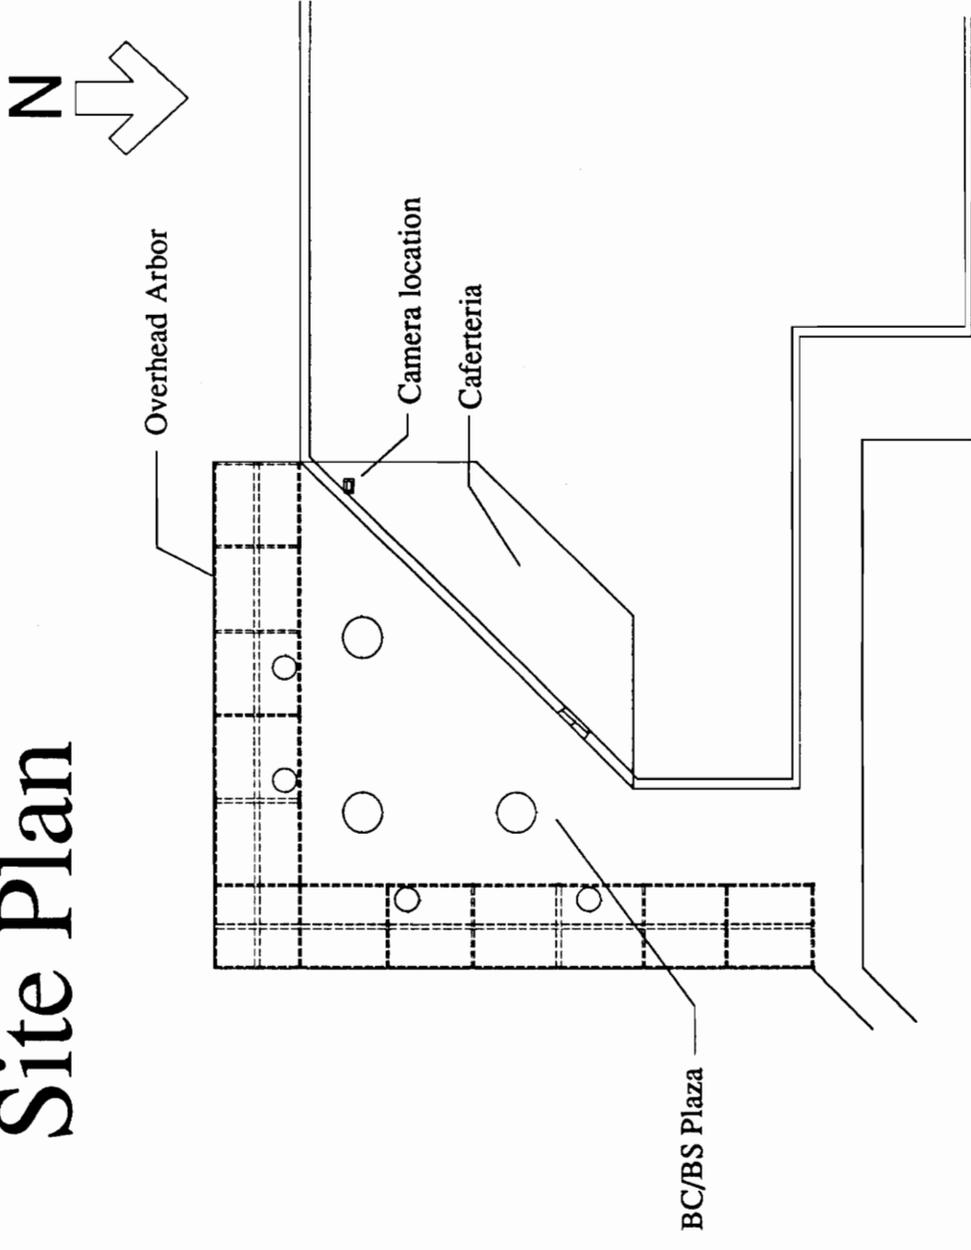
Site Plan - Blue Cross/Blue Shield Plaza
